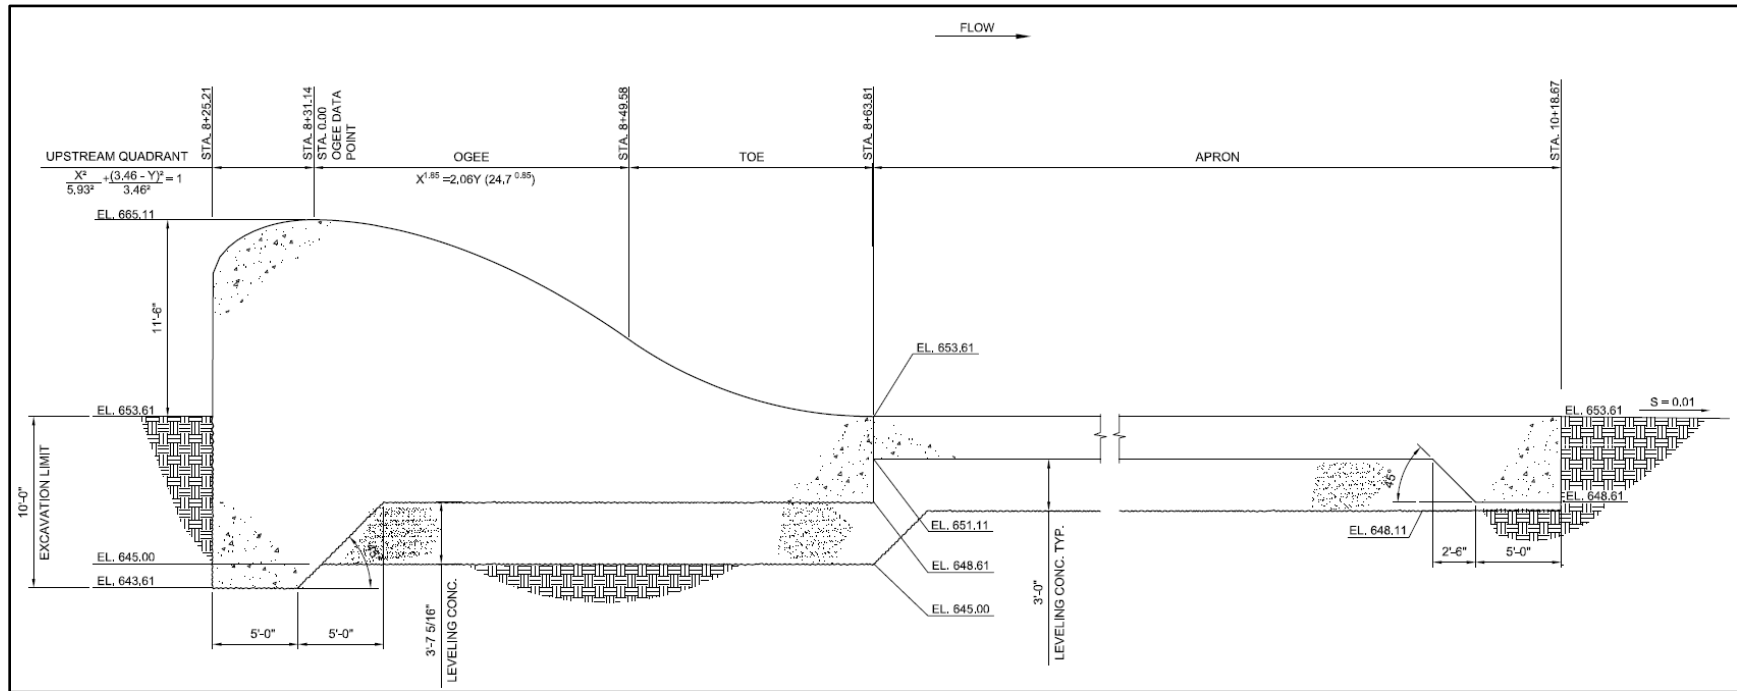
Side view cross-section of the proposed spillway ogee weir with downstream apron.
